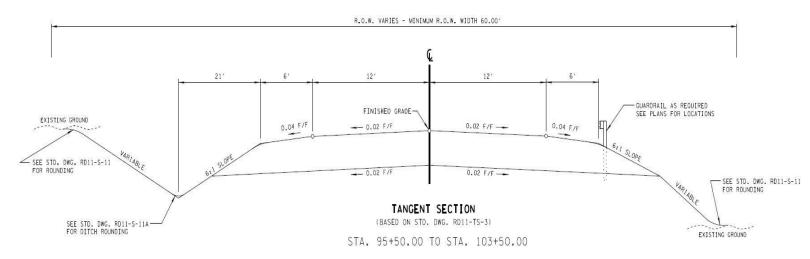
Typical Section of SR-1 over Branch, LM 2.89 according to the 06/12/2019 Preliminary Plans.
